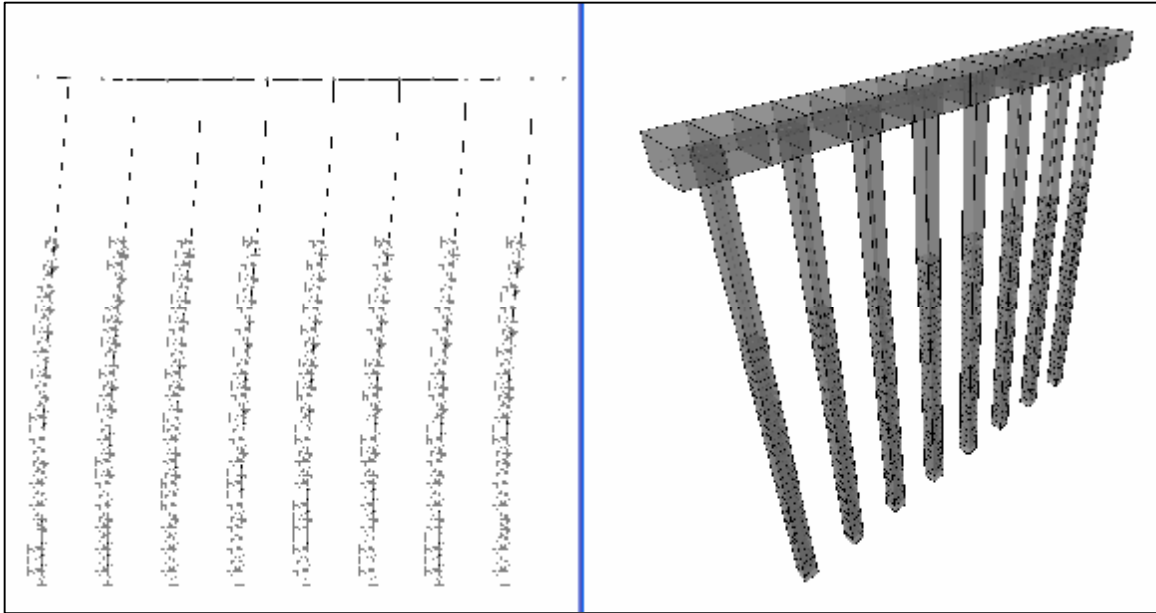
SAP Model—Halifax County Bridge, Deformed and Unloaded Shapes
